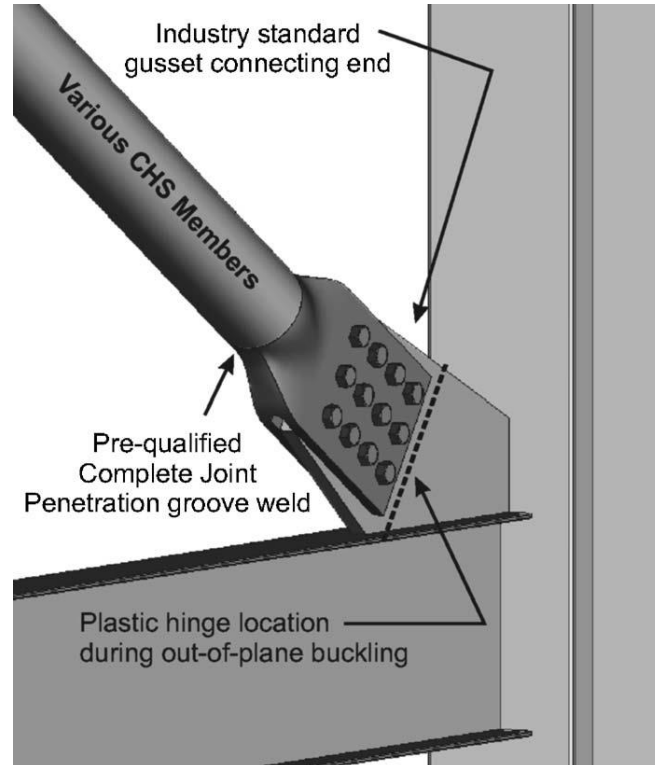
Cast steel bolted connection (de Oliveira et al. 2008)
